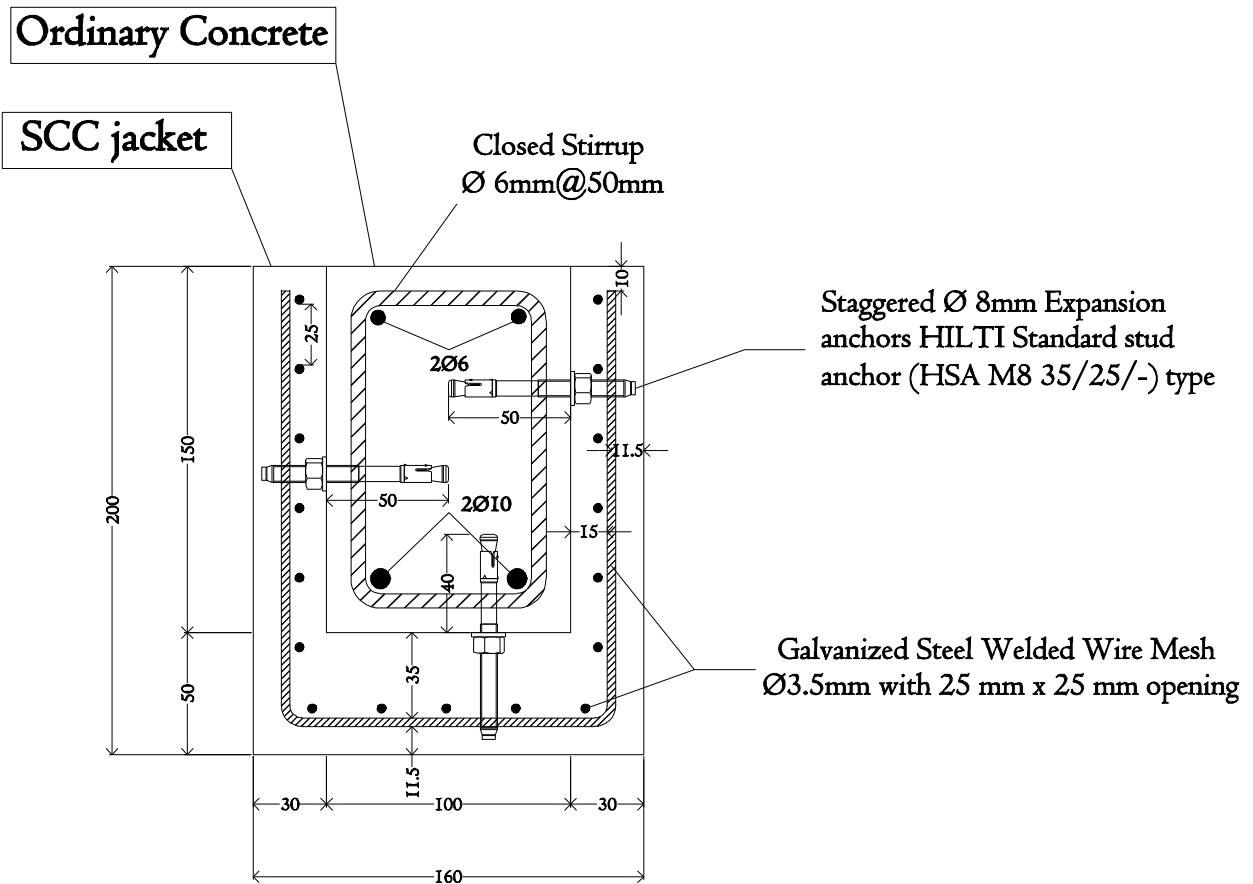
Strengthened beams GA.B1 and GA.B2 cross section (mm).
